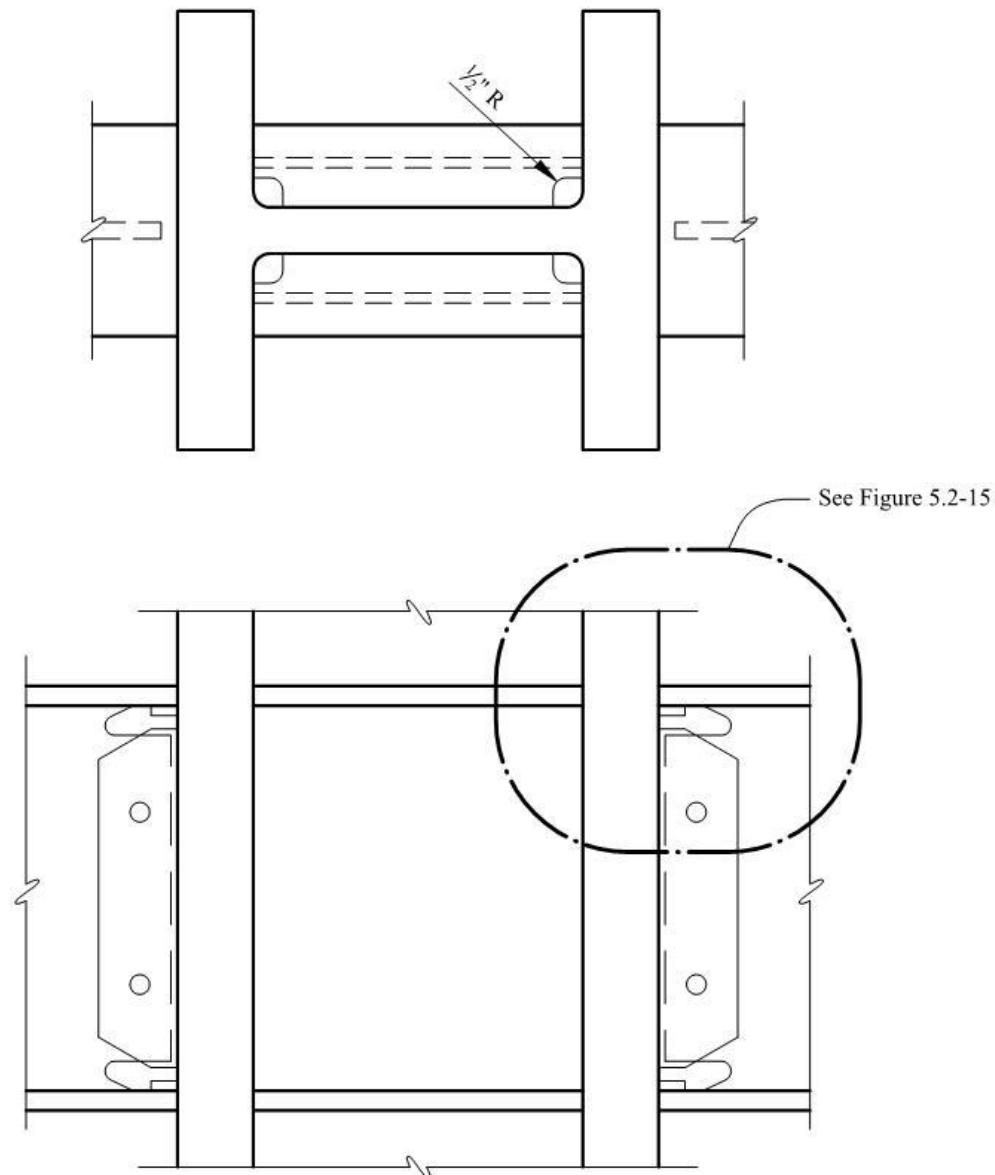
WUF-W connection, Second level, NS-direction (1.0 in. = 25.4 mm).
